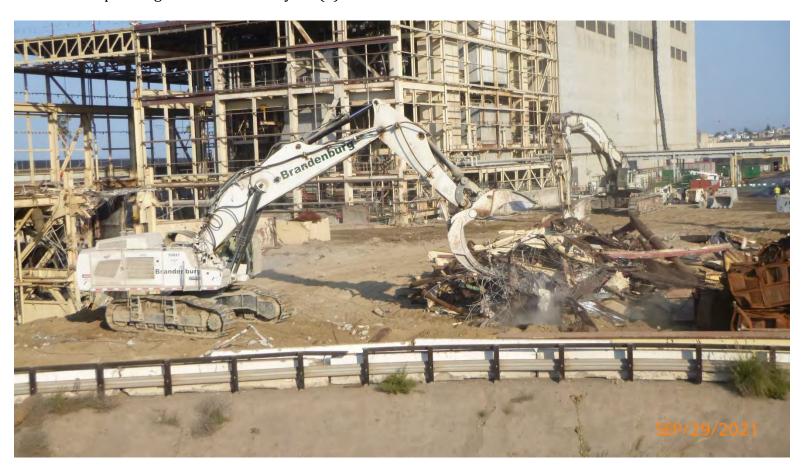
Unit #5 Structural demo ongoing east face. (a)
